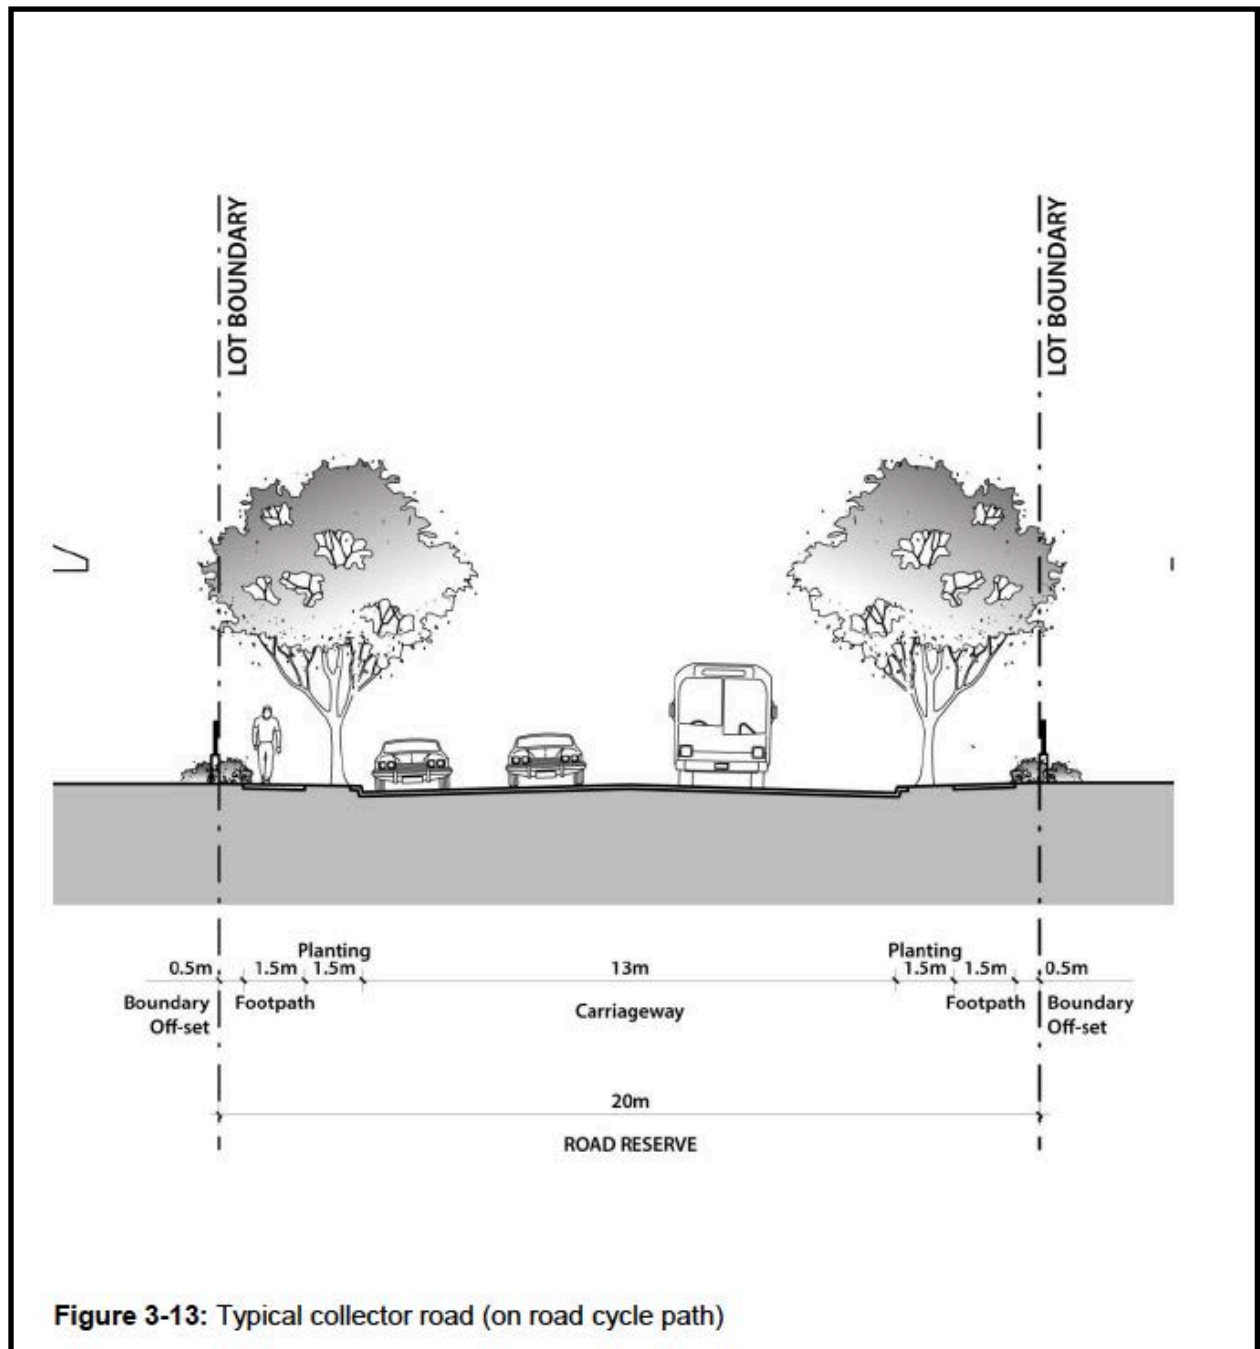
Typical Collector Road section (ie. Byron Road frontage of the project site)
